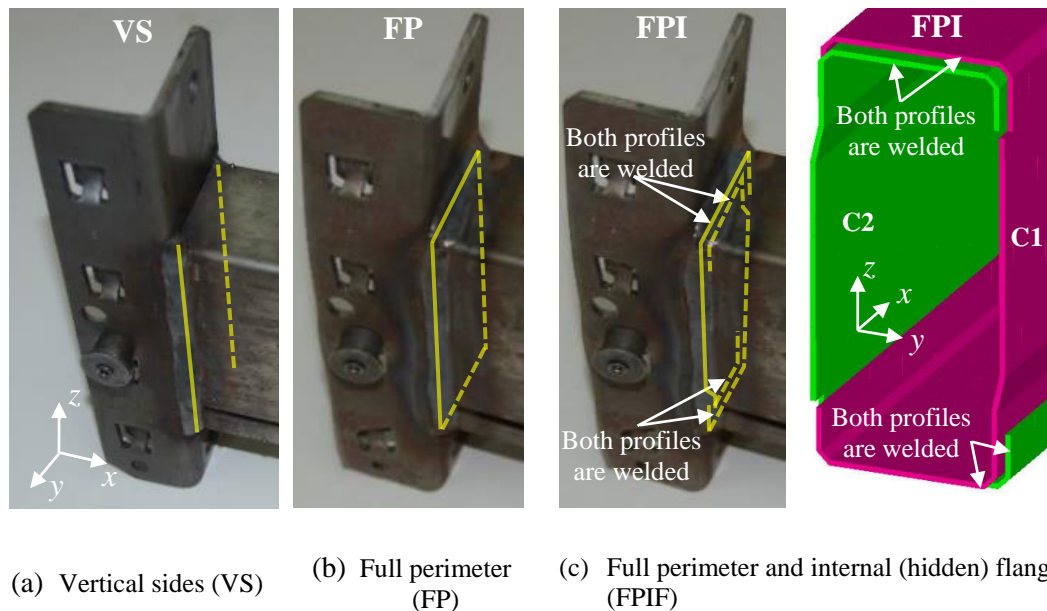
Beam-to-endplate weld beads configurations [14]
